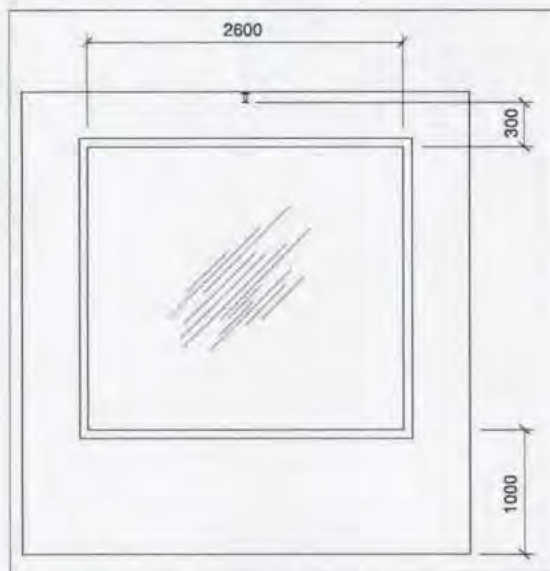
Location (ideal) of ceiling-mounted pendent sprinkler relative to window assembly (elevation)
